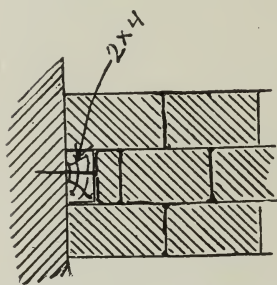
Simple Method of Joining New to Old Brick Walls.
